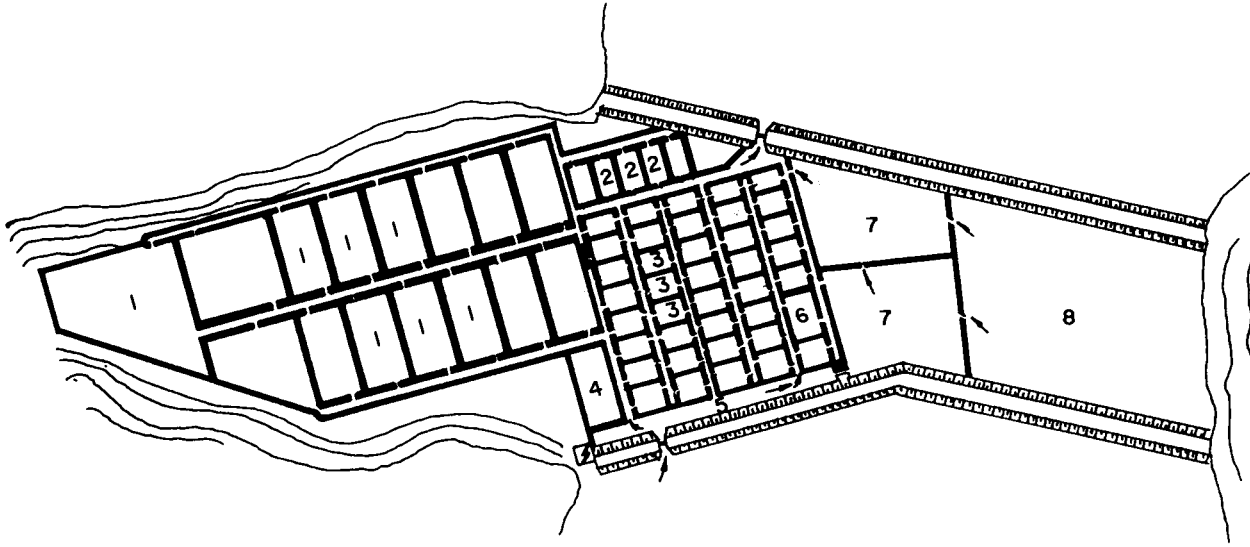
Plane figure showing opposite inlet and outlet type ponds.
